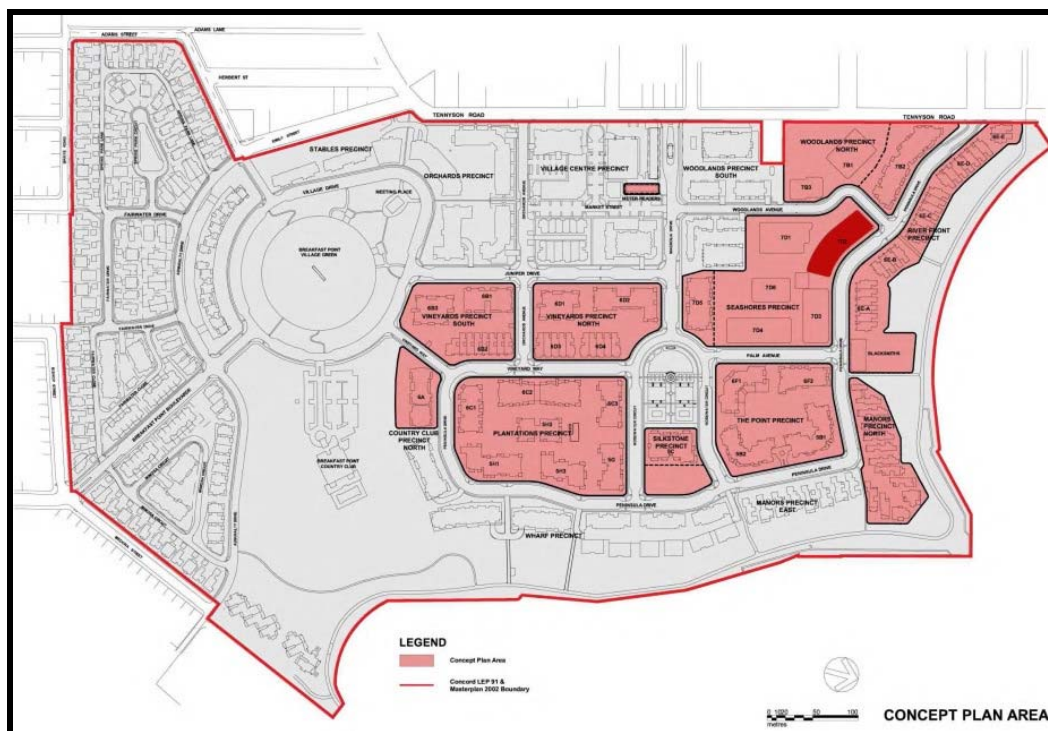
Location of subject site (Building 7D2, shown in red) within the Breakfast Point Concept Plan 2005 area (shown in pink)
